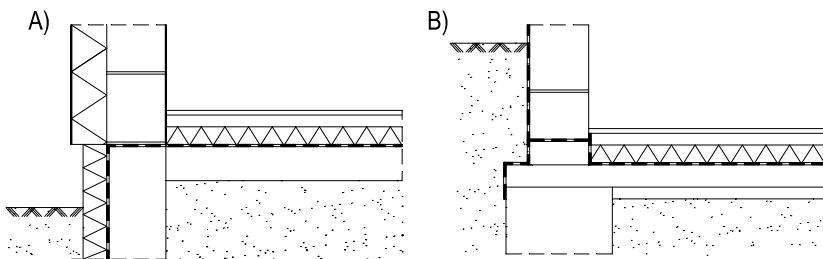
Examples of traditional solutions for floors built on the ground and joined with the external wall (Source: own elaboration)
